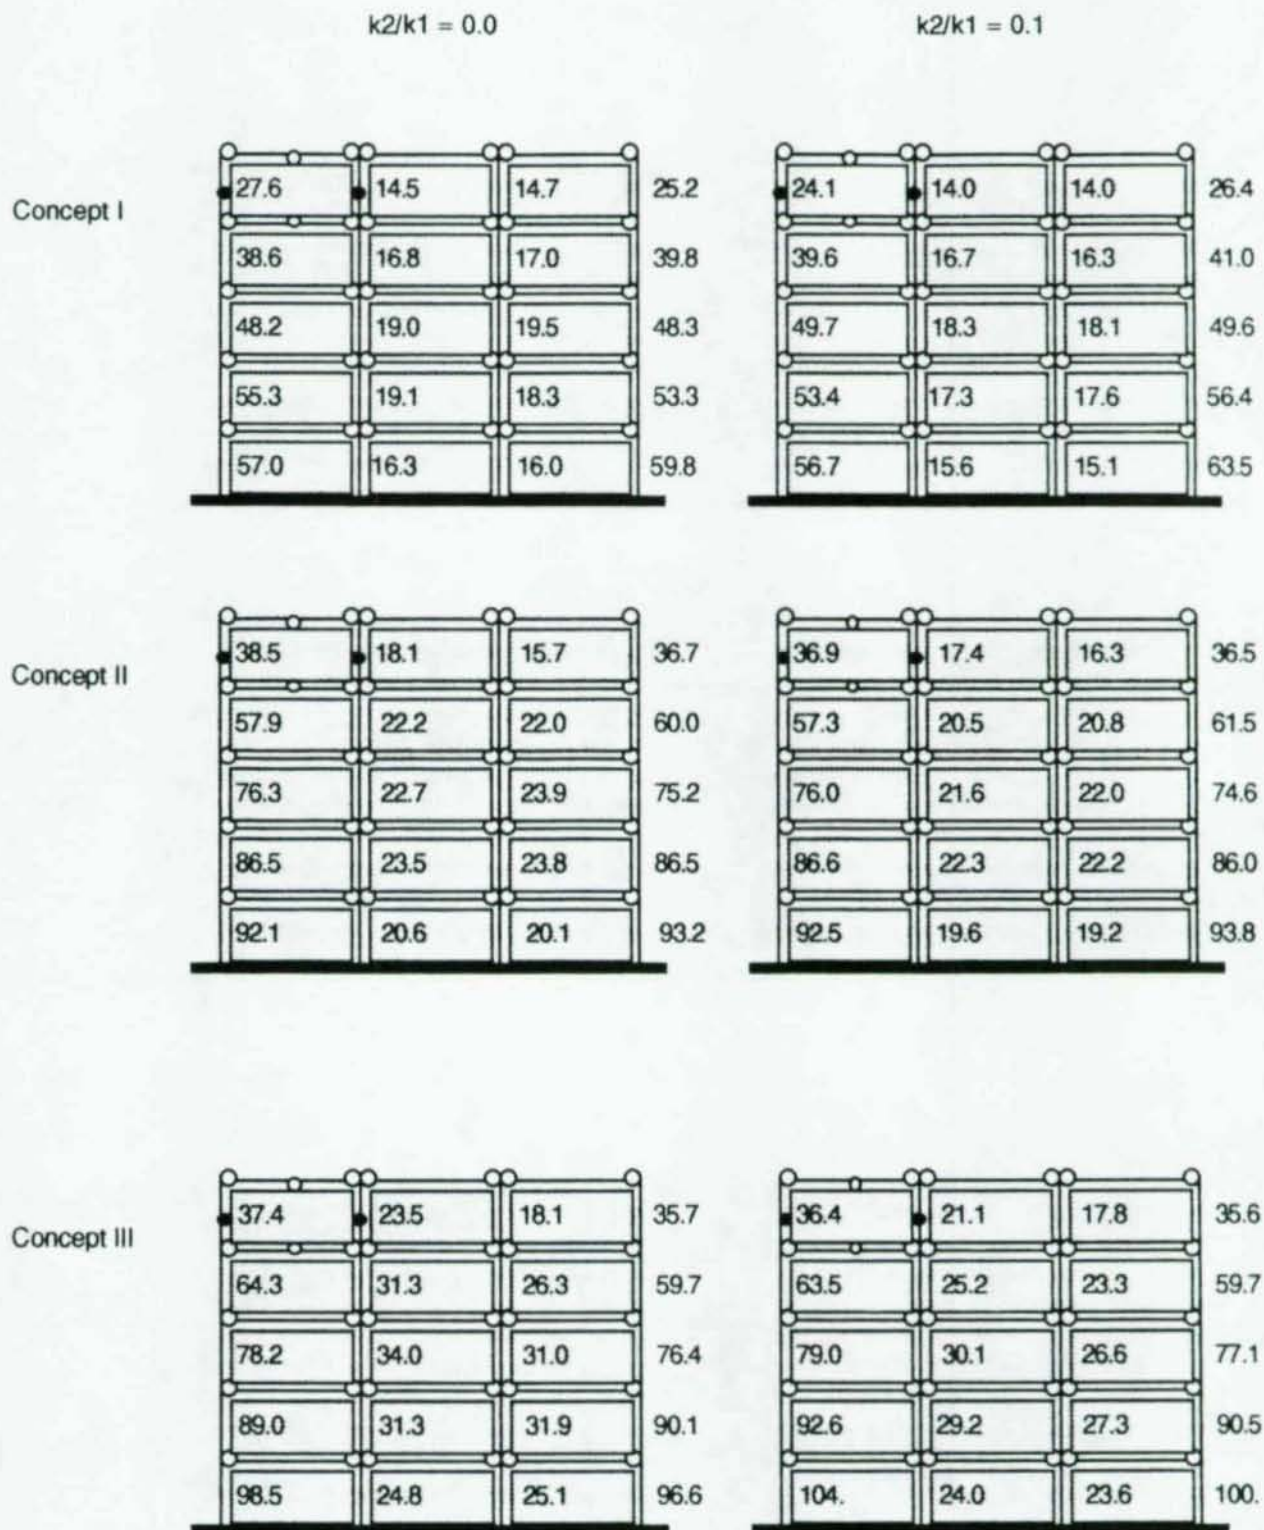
Clad Frame C: Envelopes of Forces (kips) in Side Panel Connections
